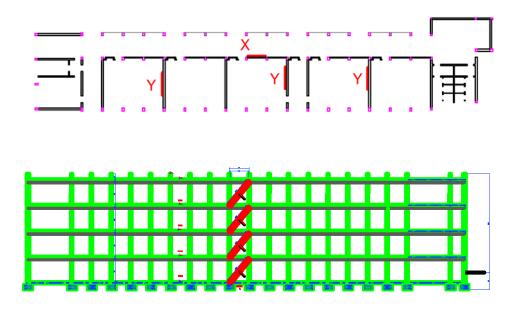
Disposition and Shape of vertical Stiffeners at X direction
